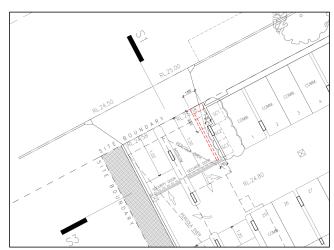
Extract of the proposed basement plan indicating the location security door and intercom to gain access to the basement car park.
